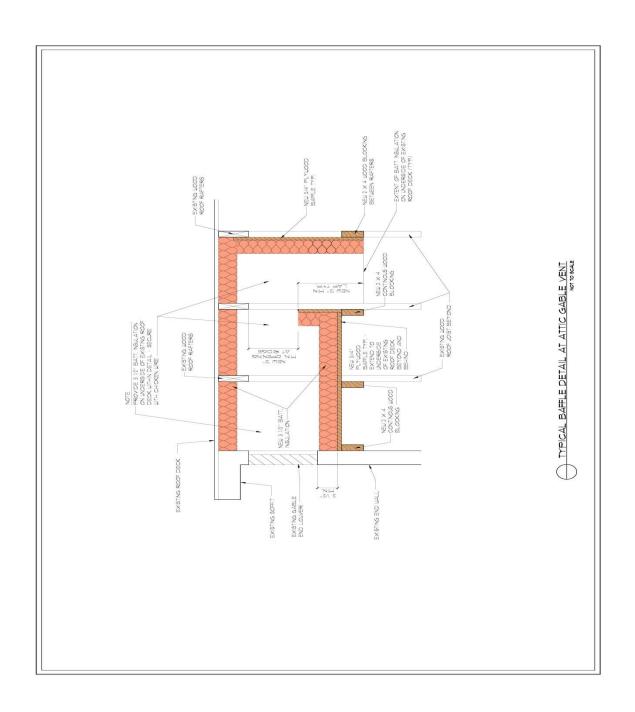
Typical Baffle Detail at Attic Gable Vent
